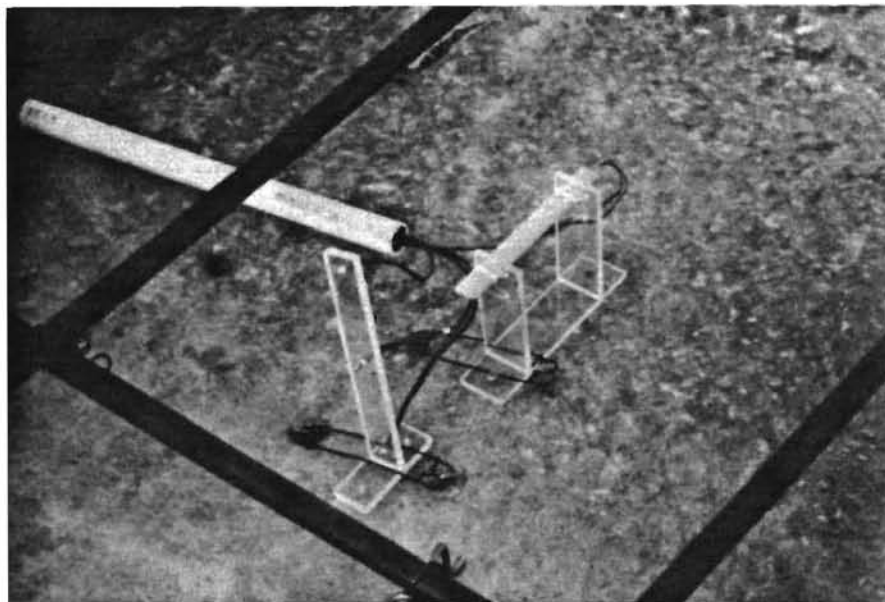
Thermocouples and embedment strain gages on plexiglass chairs before concrete placement.
